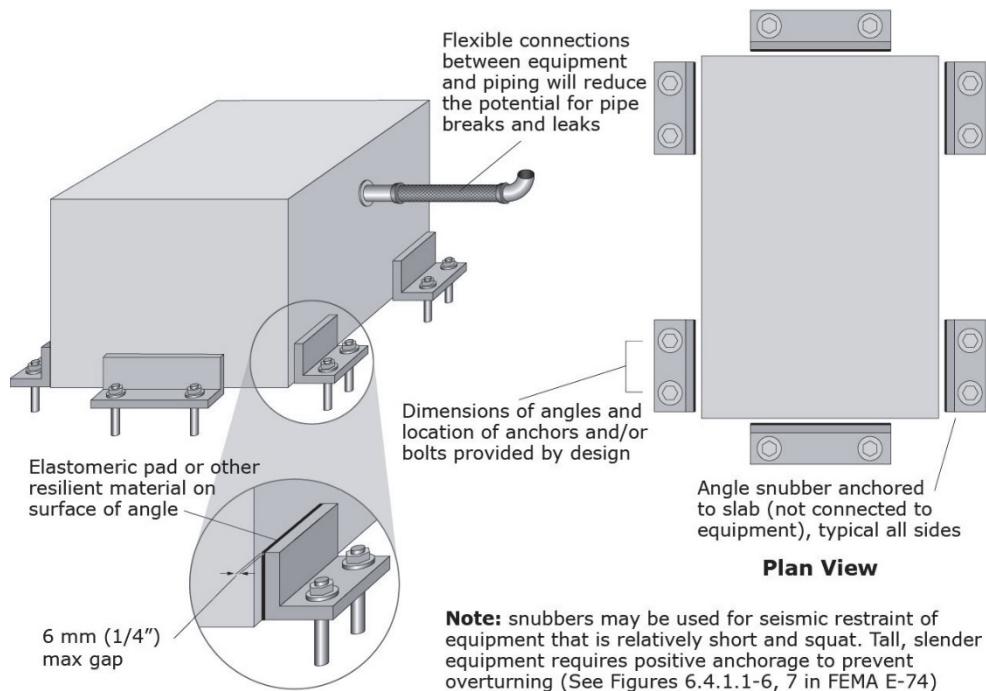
Example of anchorage for floor-mounted equipment restrained with snubbers (adapted from FEMA, 2012).
